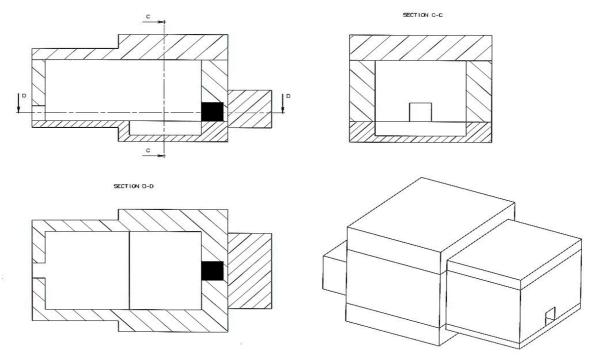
The shielding of the NC-Cave is integrated in the construction of reinforced concrete
